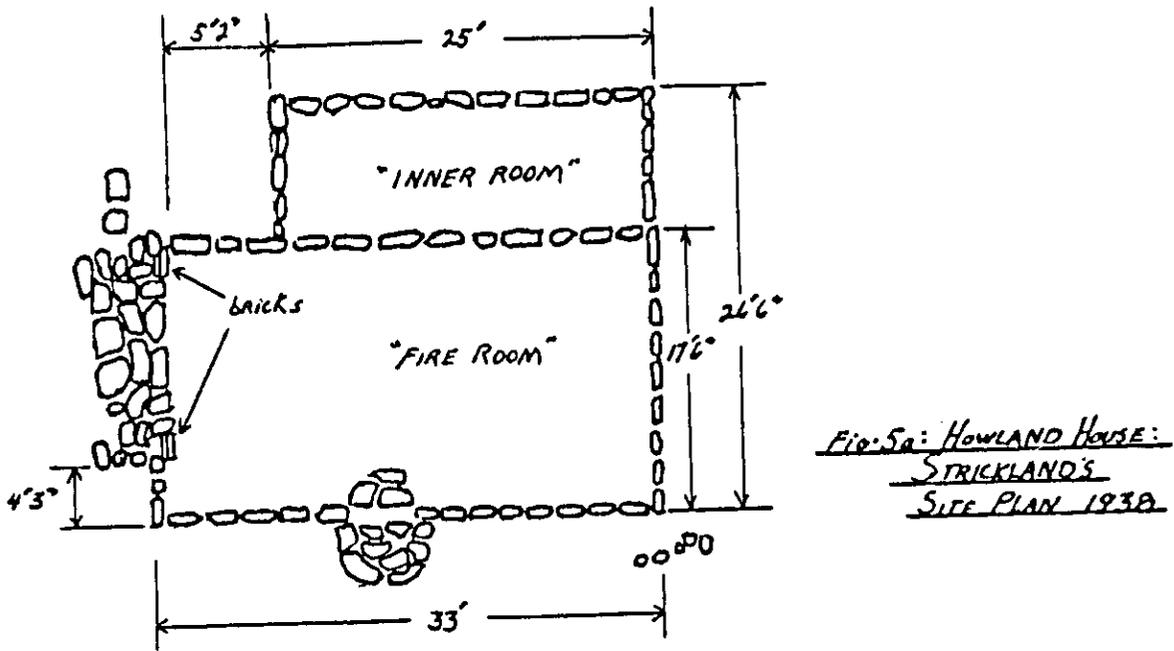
Plan of John Howland's 17th-century house in Kingston, Massachusetts, as drawn by Strickland (1938) and illustrated in Travers (1987).
